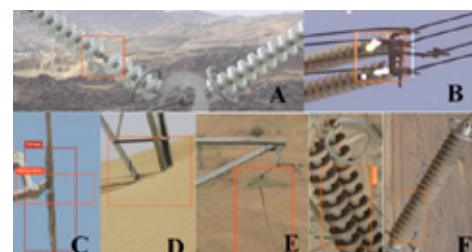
A sample of common defects: (A) missing plate along the insulator chain; (B) Corona discharge (C) damaged strand of the ductor and broken clamp; (D) sand accumulates around tower foundation; (E) cable joints, which are more frequently hot spot sensitive; (F) a string of insulators, polluted.
